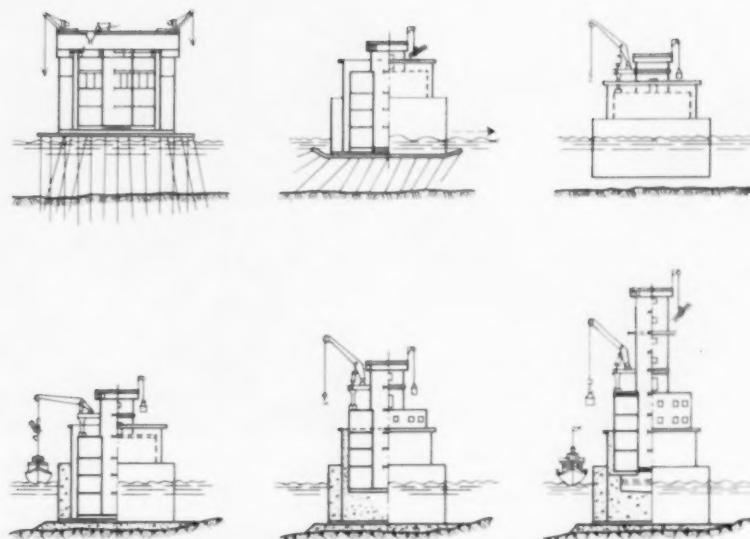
Caisson sets for the Grundkallen Lighthouse were built near shore on a pile-supported platform. The inclined piles on one side were removed and jacks used to push the platform over, thus launching the 59-ft-high unit. The caisson was sunk on a prepared base and the inner units lifted by pumping water into them. They were then permanently held in place by intruding grout into prepacked stone.
